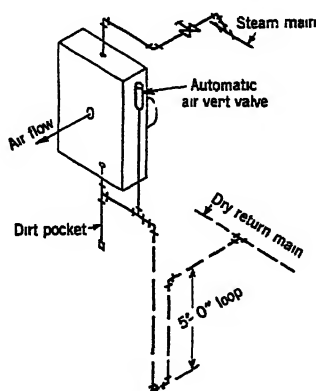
UNIT HEATER CONNECTED TO ONE PIPE AIR VENT SYSTEM
